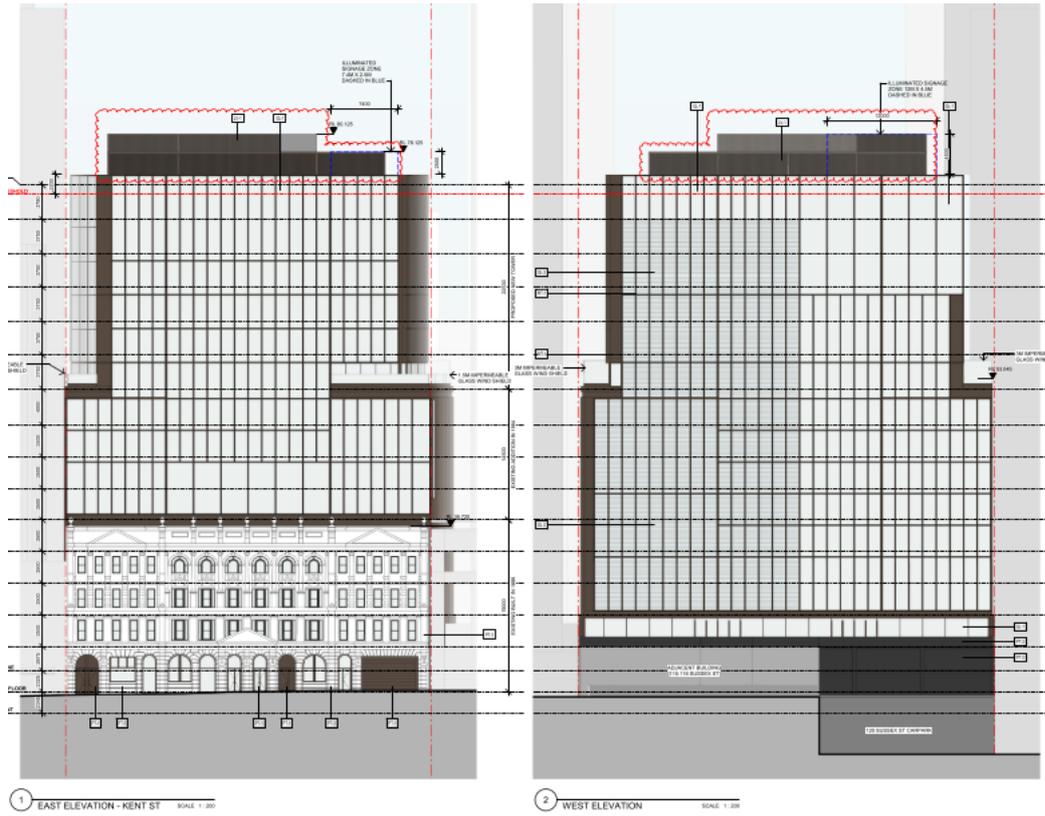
Proposed east (Kent Street) and west (rear) elevations
